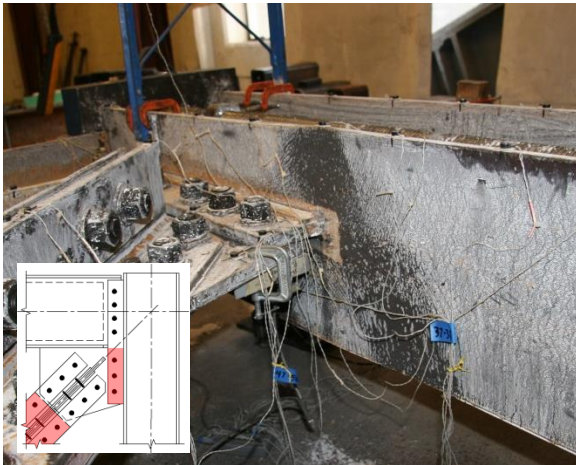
Column Damage in Plastic Hinge Locations for BRB Retrofit Tests
